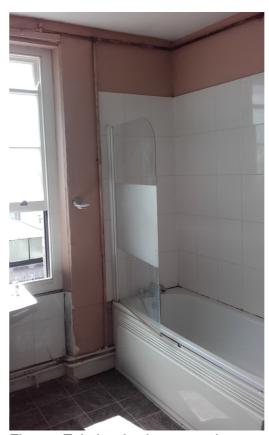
Existing bathroom to be upgraded and rear window to be replaced to match existing
